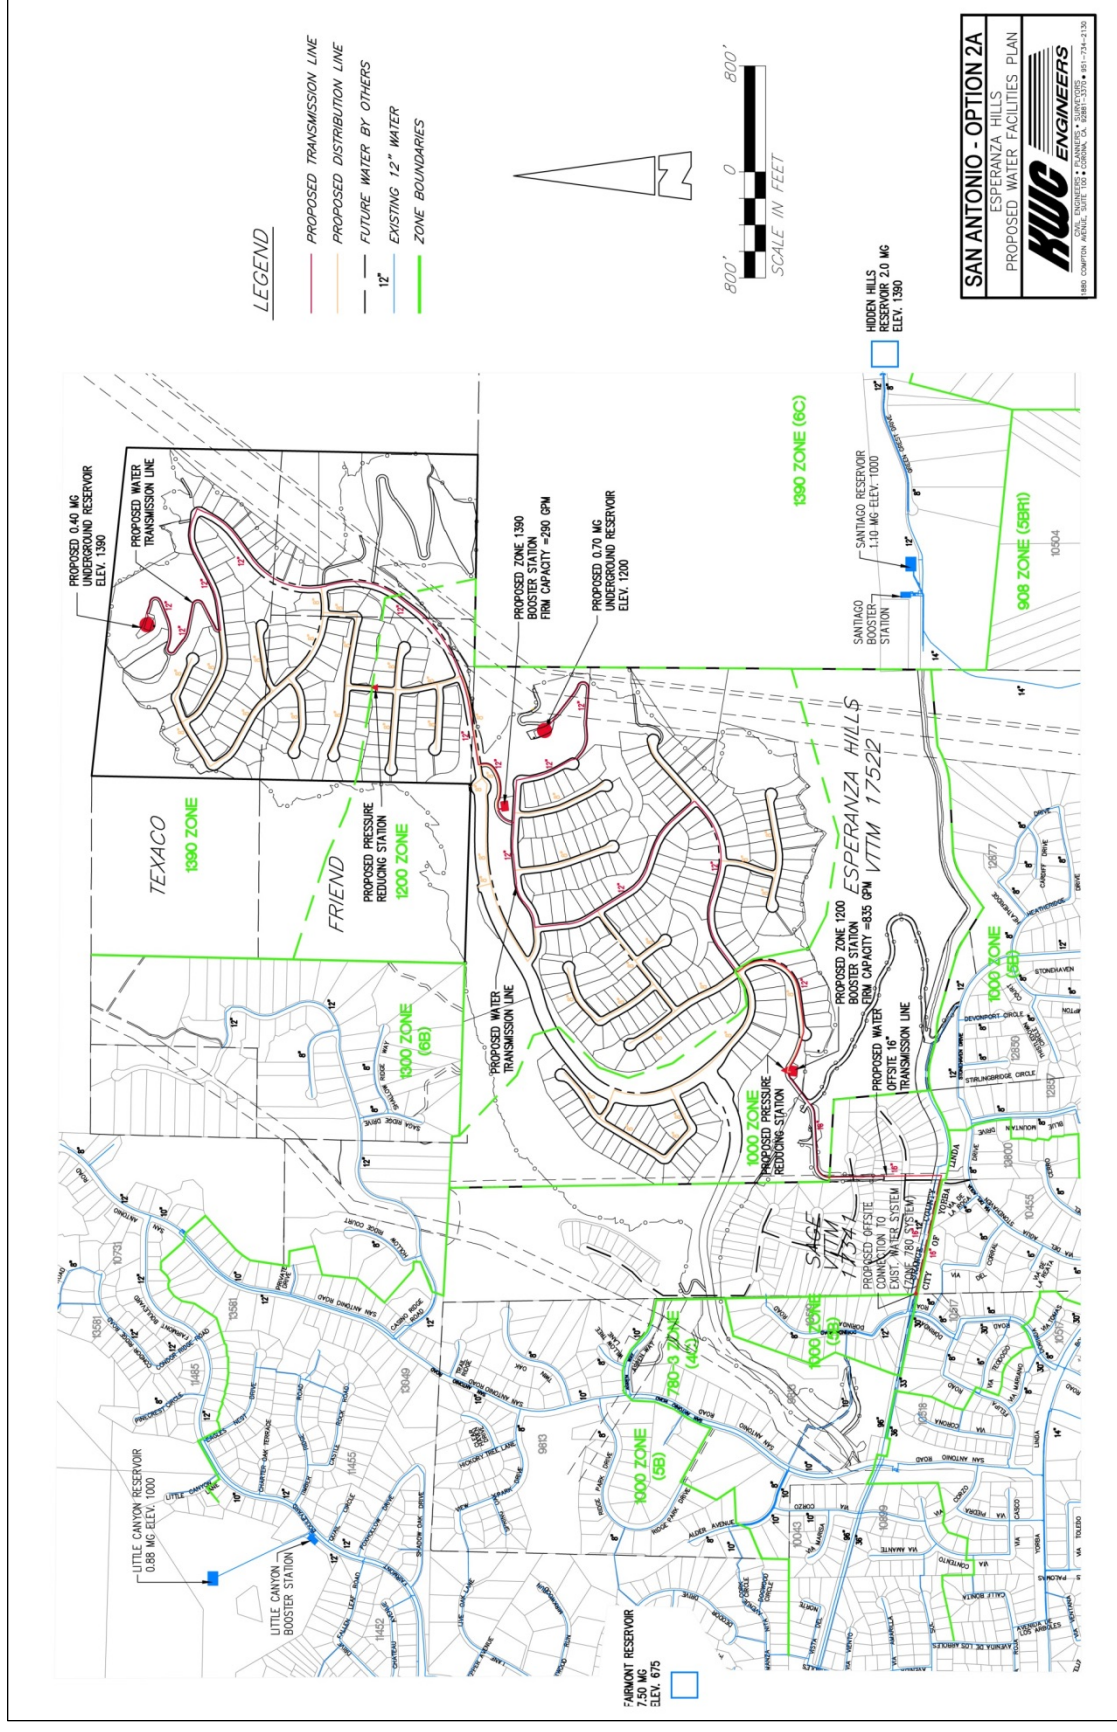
Proposed Water Facilities, Option 2A
